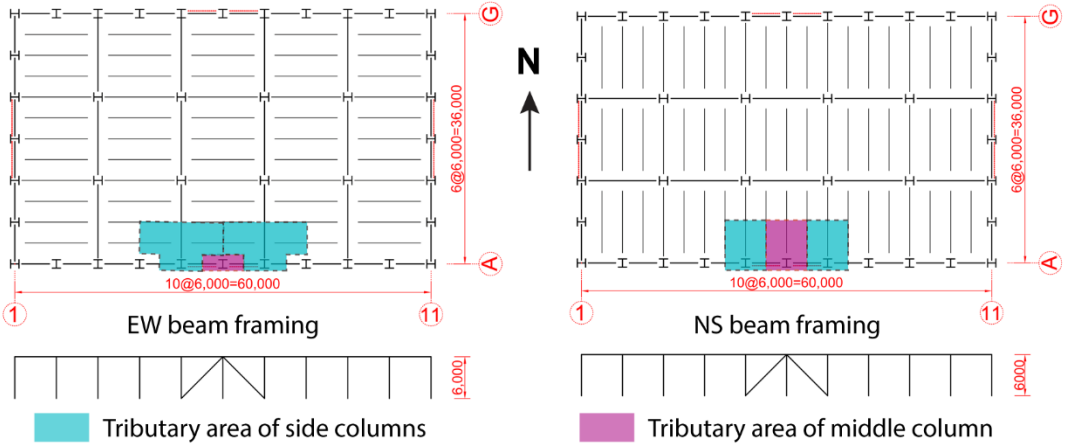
Building plans with different secondary beam orientations (dimensions in mm)
